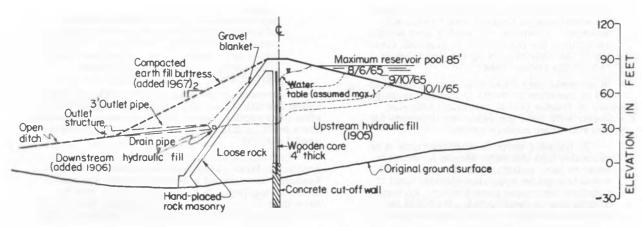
Typical Section of Wahiawa Dam, Hawaii
